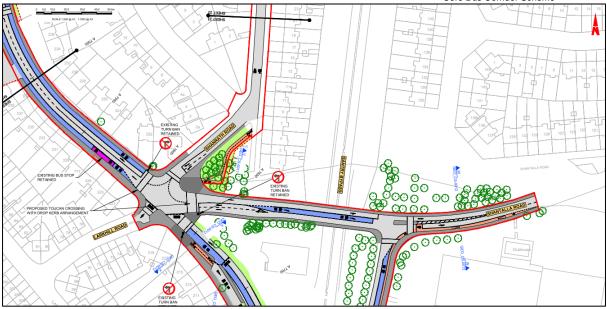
Extract of General Arrangement Drawing at Shantalla Road Bridge (Sheet 23)
